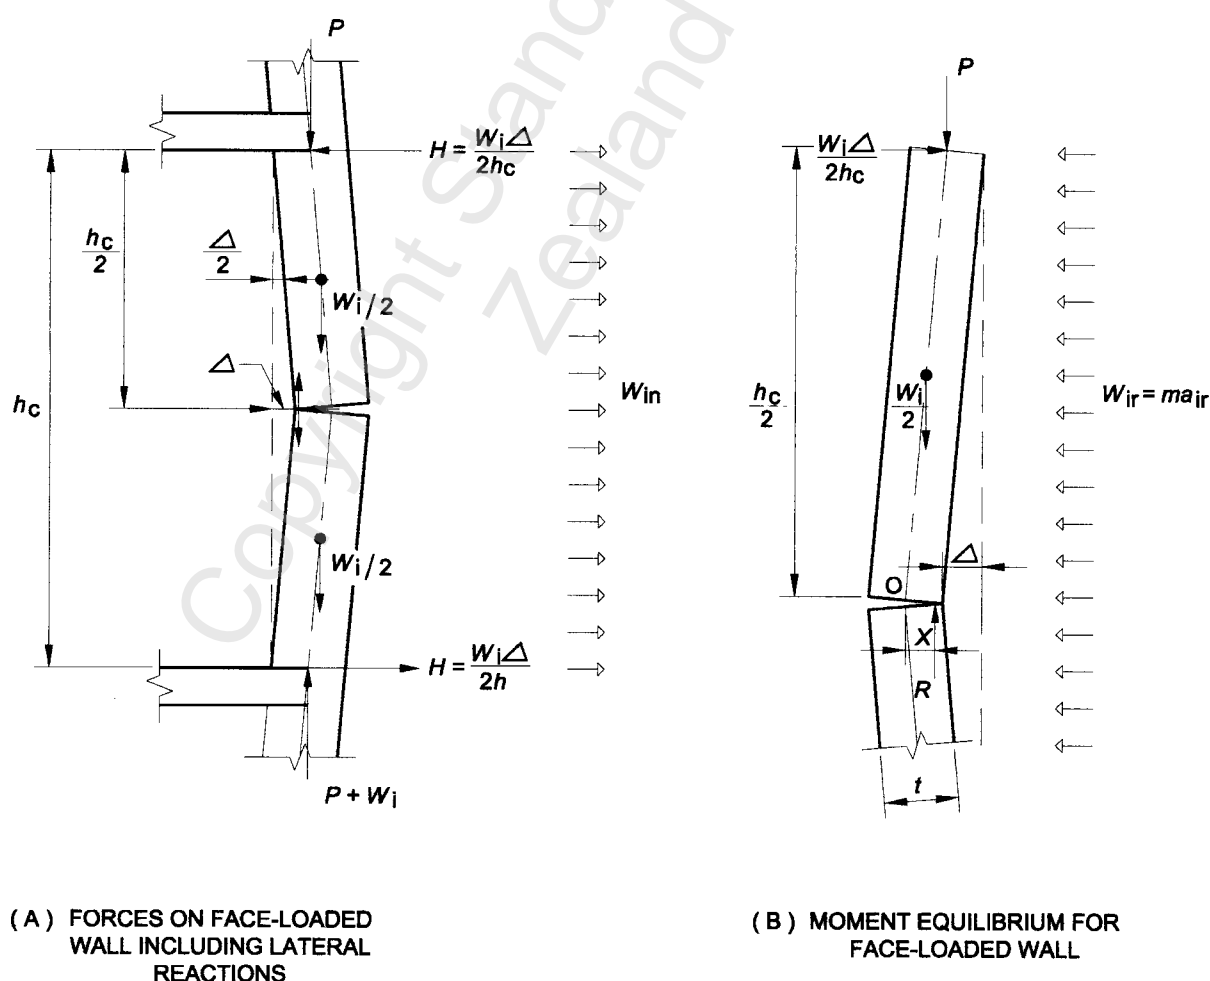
Summary of loads, forces and actions on unreinforced earth wall
